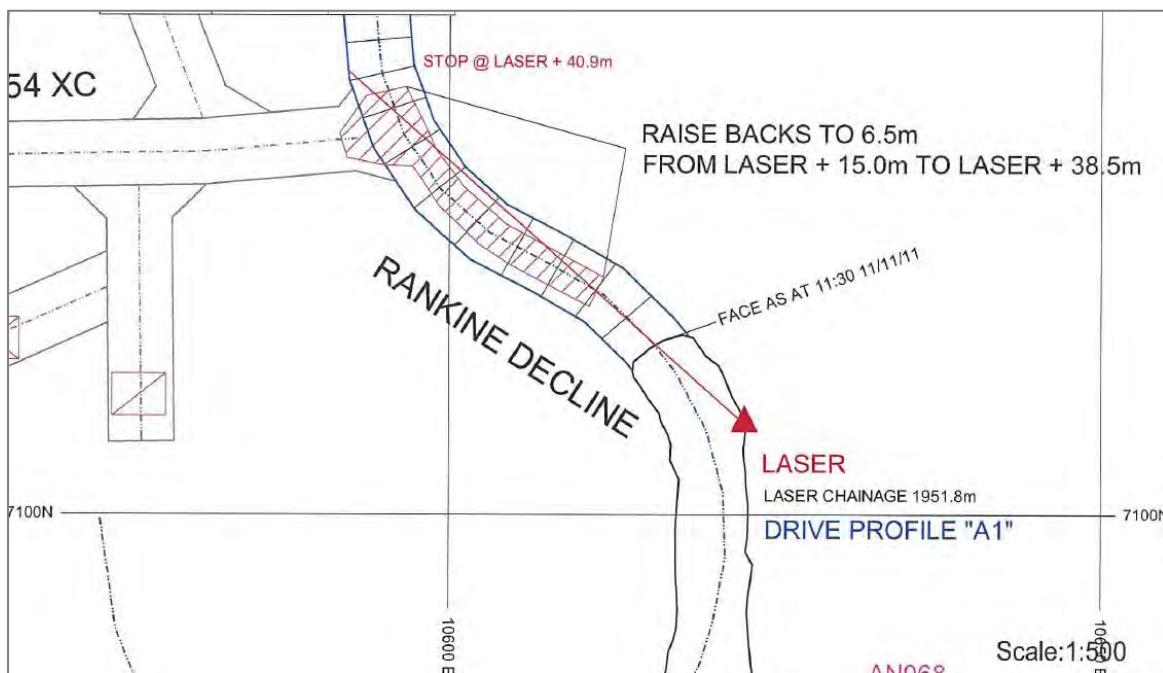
| EXTRACT FROM A DEVELOPMENT PLAN FROM AZM SHOWING AREA (HASHED) TO BE STRIPPED FOR HANGING AUXILIARY VENTILATION IN DECLINE (AZM AFC 623). A SIMILAR PROCESS IS PROPOSED FOR THE BIH UNDERGROUND DESIGN.
